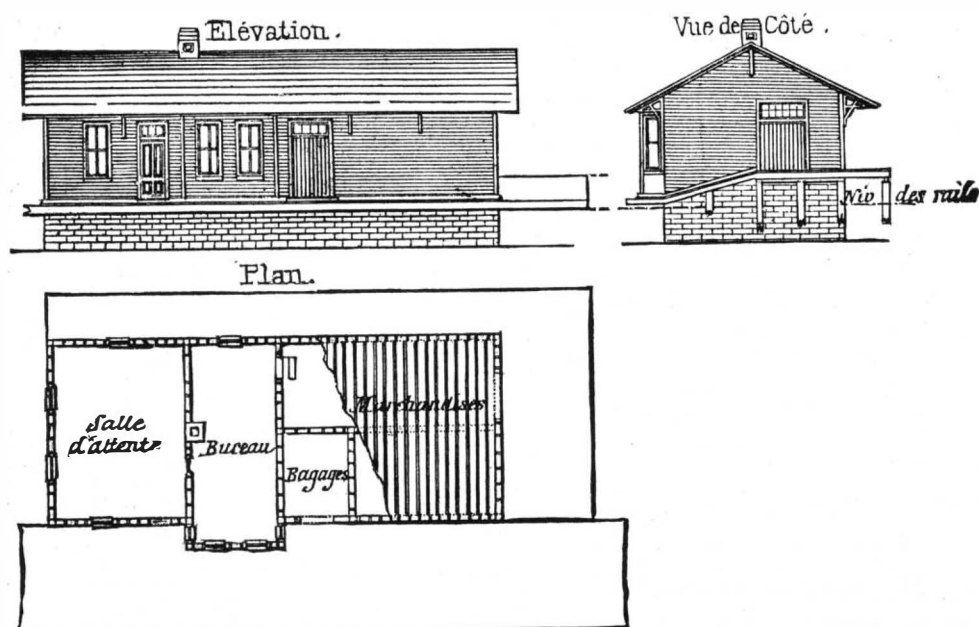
STATION BUILDING, CHICAGO AND ST. PAUL R.R. (Scale, 1-300.)
